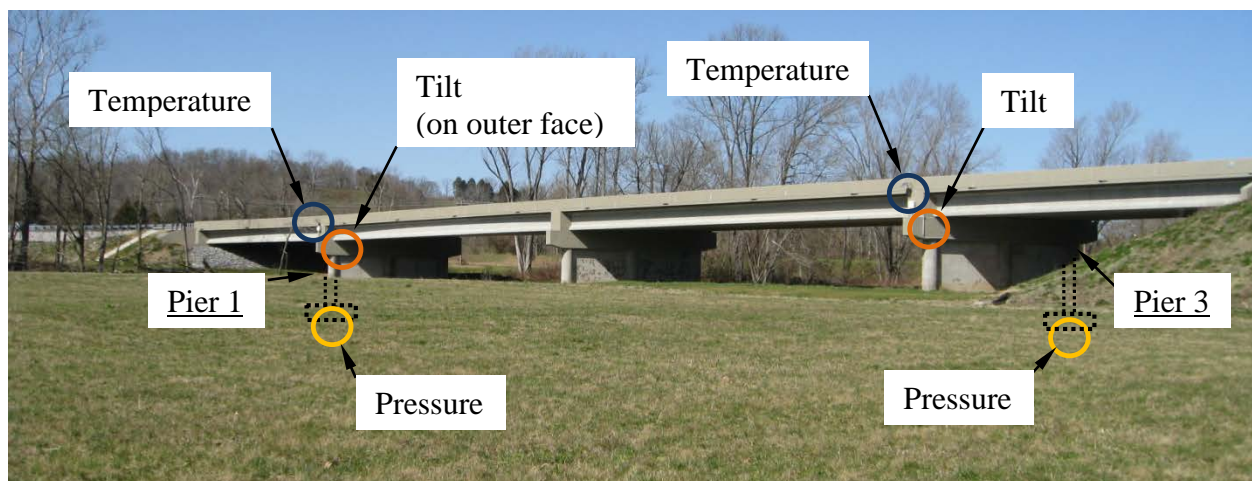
Instrumented locations at the New Trammel Creek Bridge.
